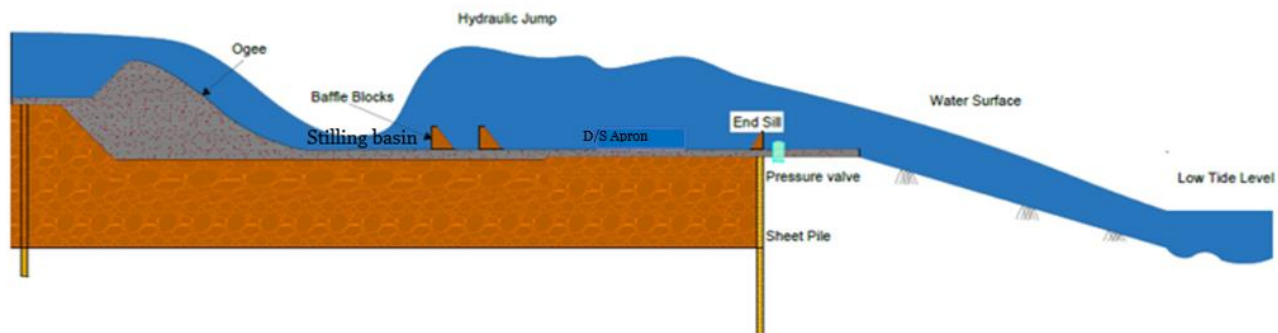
Schematic diagram showing Concrete Floor with Sheet Piles
